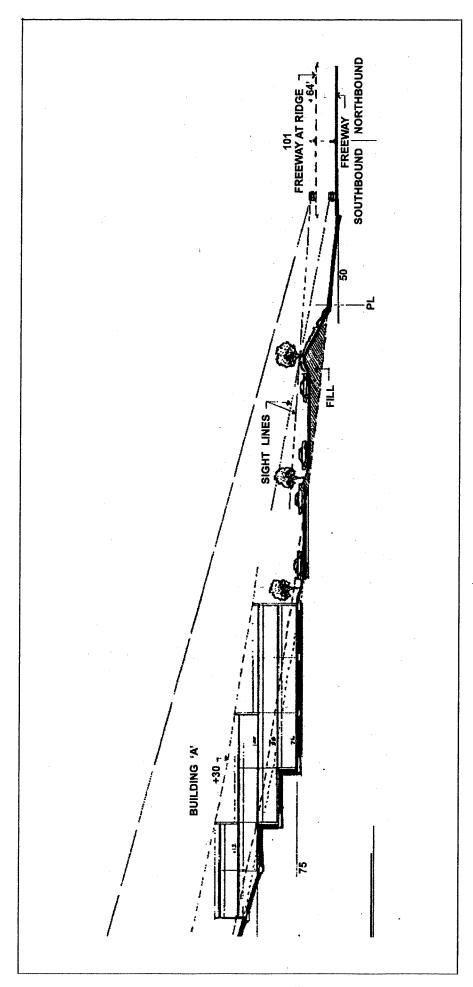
SECTION B -- OFFICE BUILDING A Oakview Master Plan
